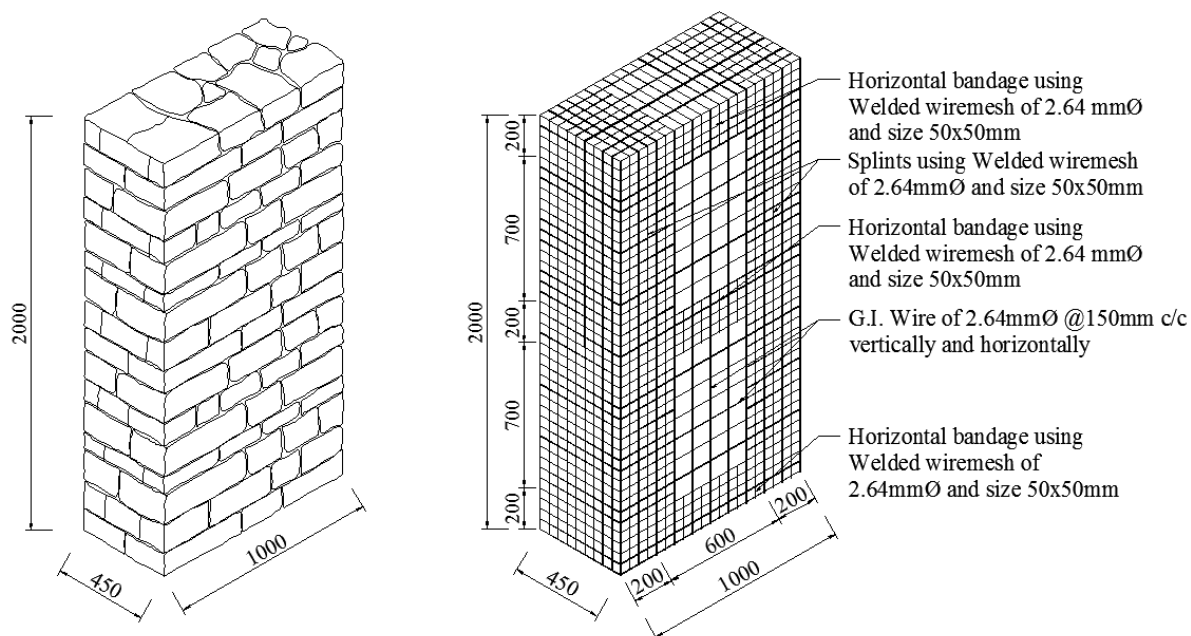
Isometric view of the test wall (left); WWM retrofitting arrangement (right)
